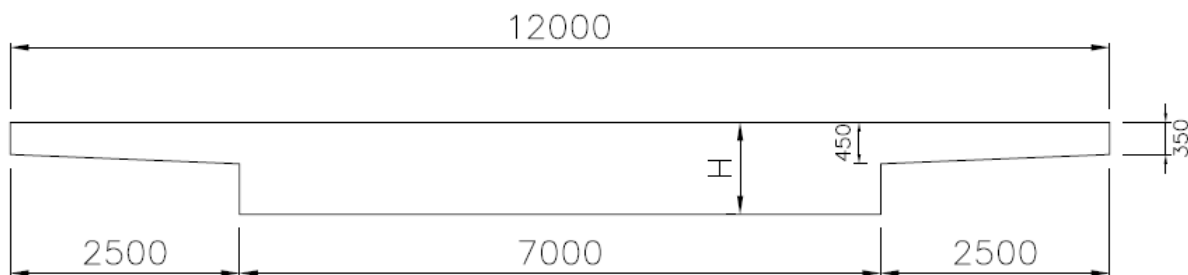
Illustration of the bridge cross section (Dimensions in mm), Figure is drawn in Auto-Cad
